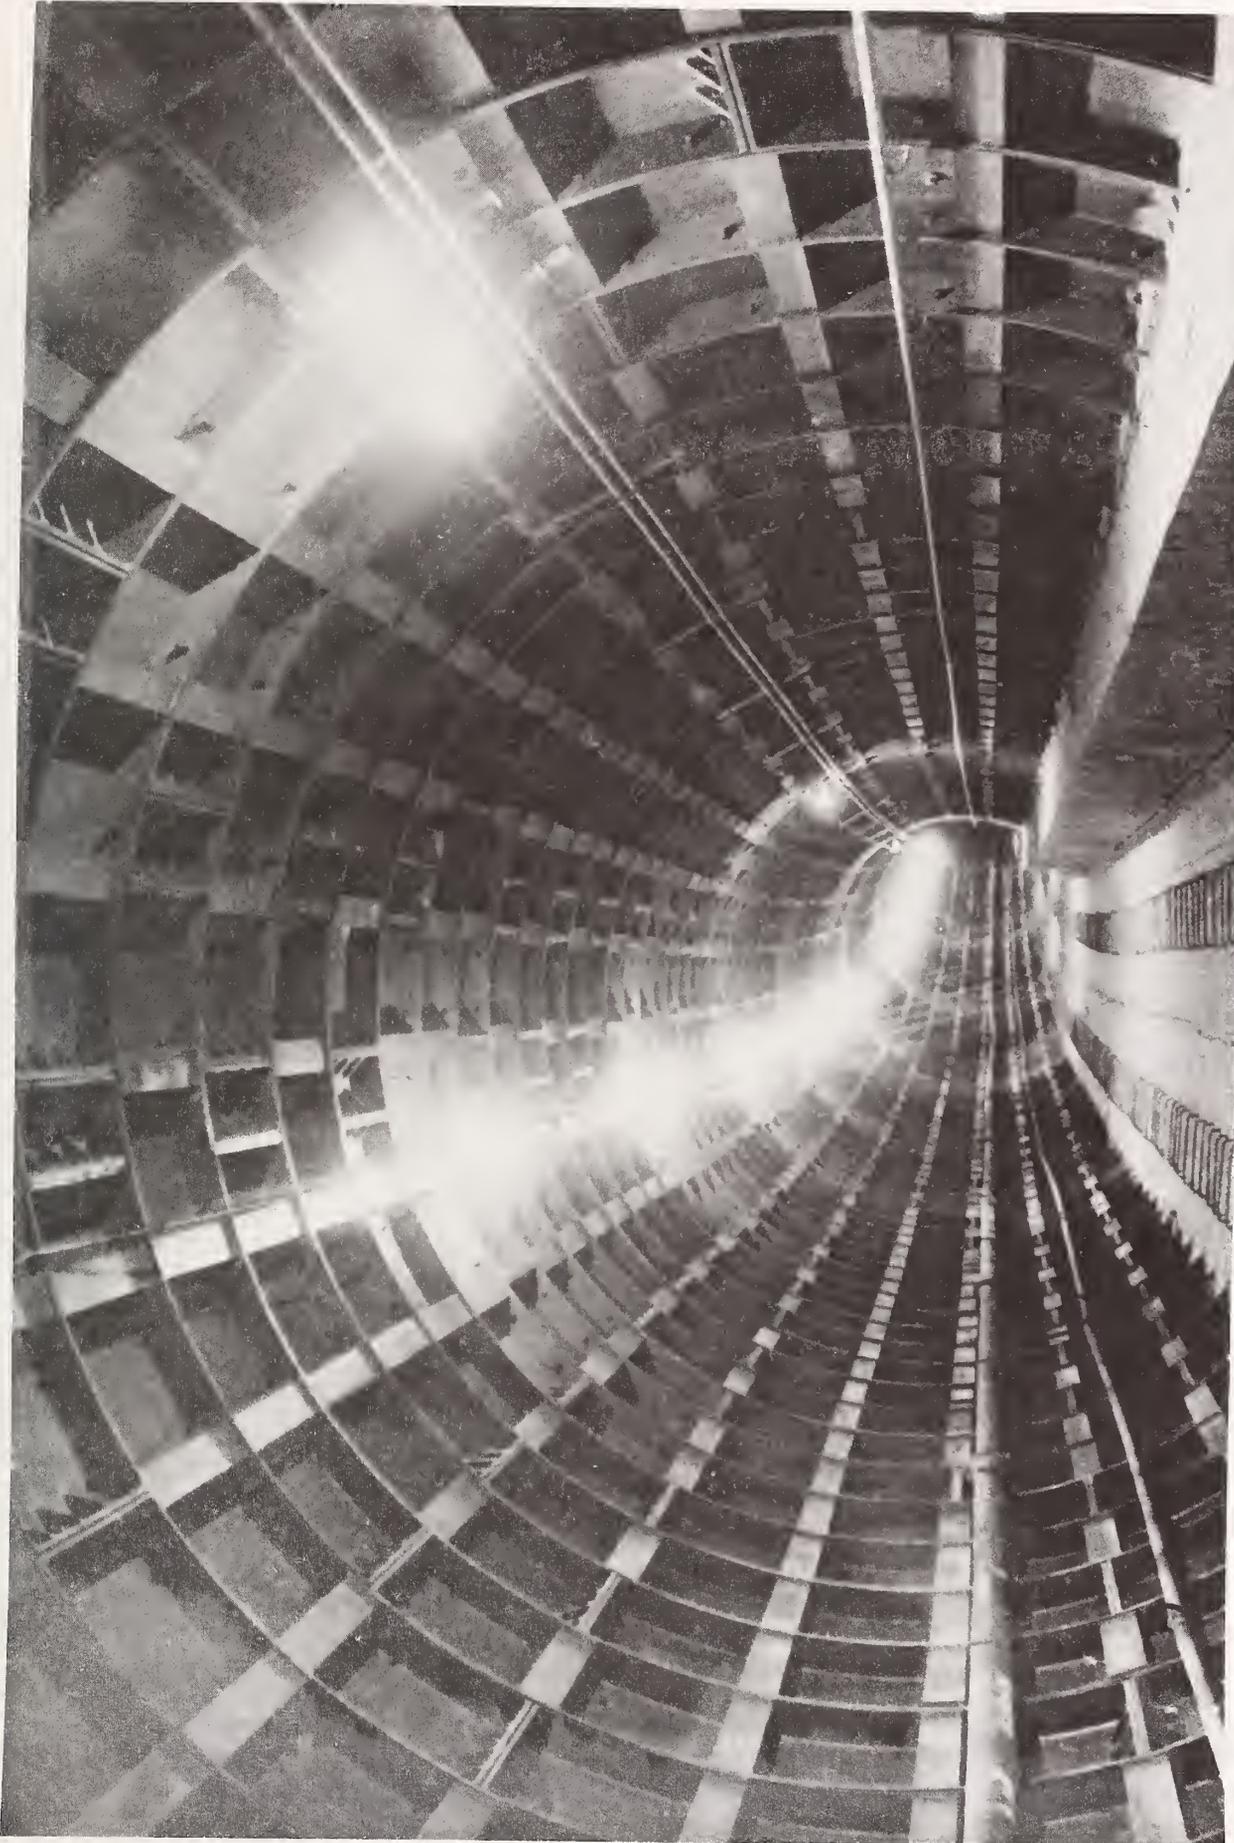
EXAMPLE OF WELL SEALED RAPID TRANSIT TUNNEL
